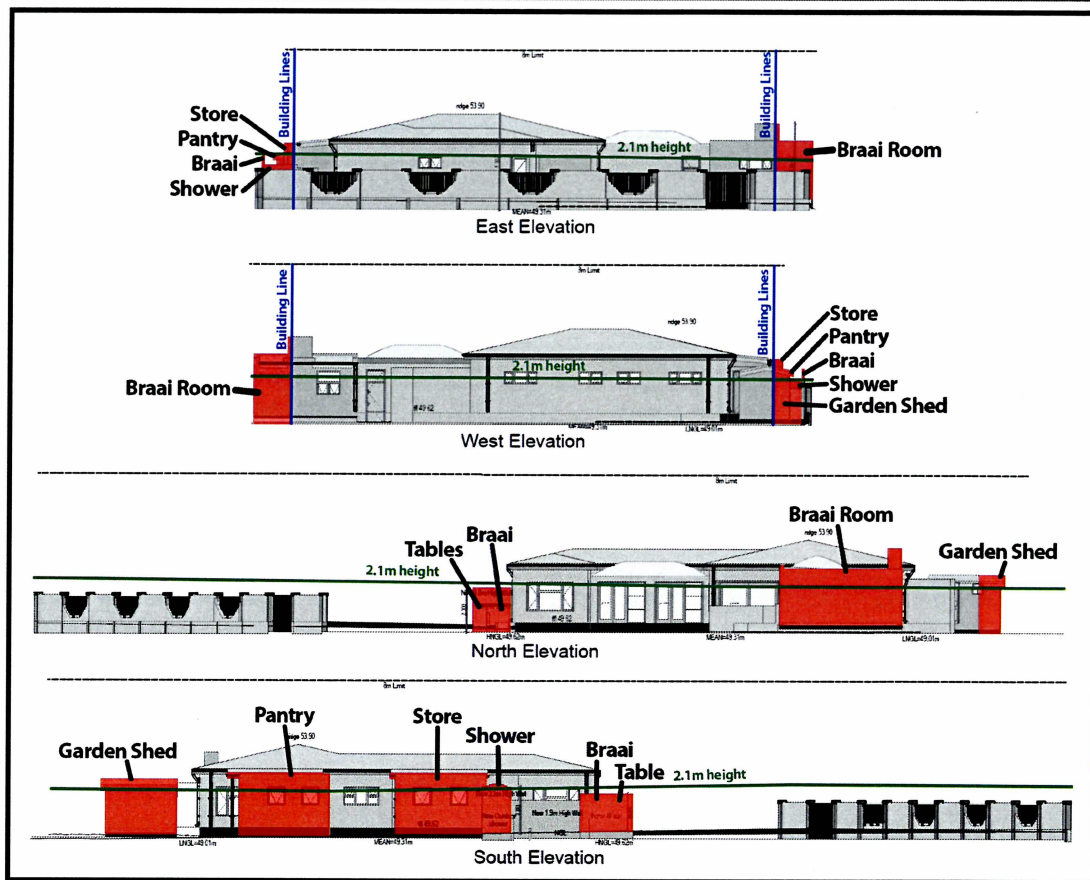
Elevations Illustrating Building Line Contraventions to be Legalised
